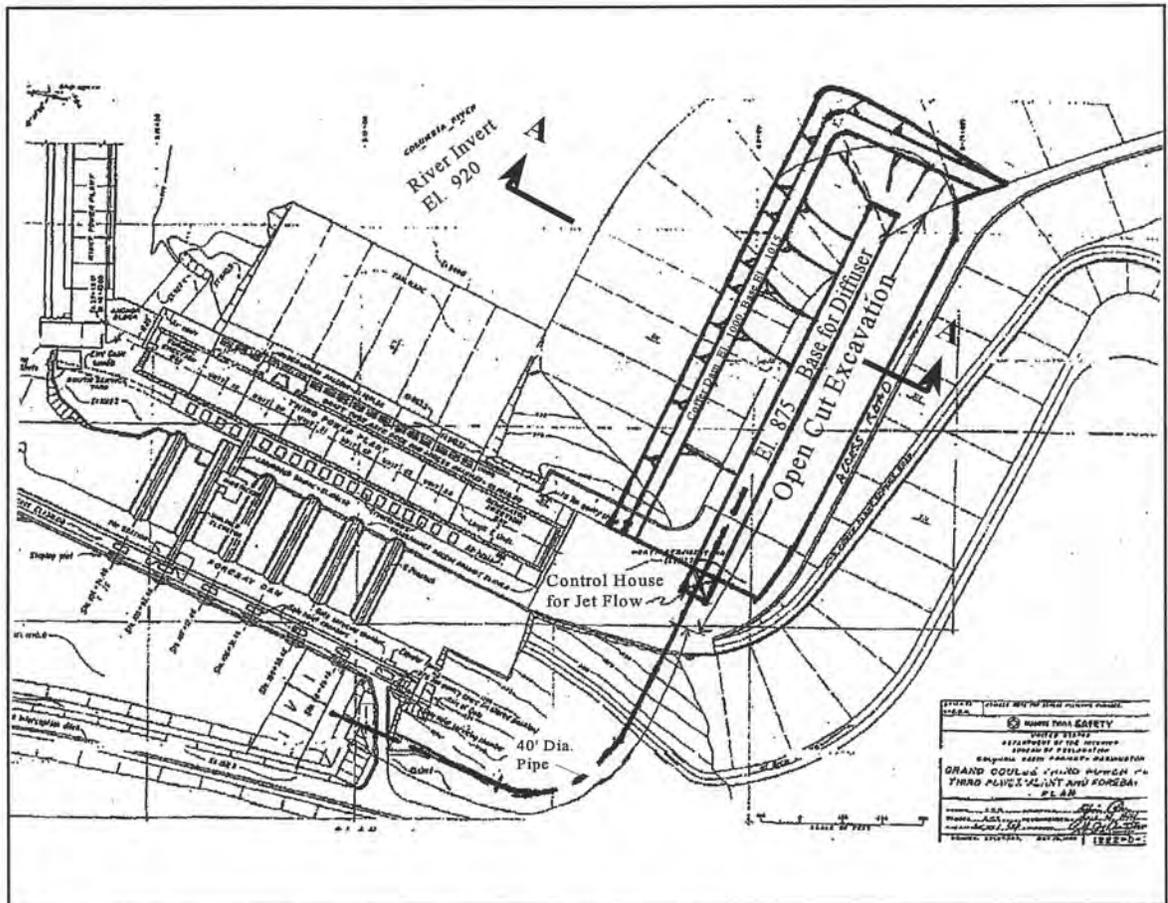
Plan view of the pipe through the forebay dam alternative No. 3.
